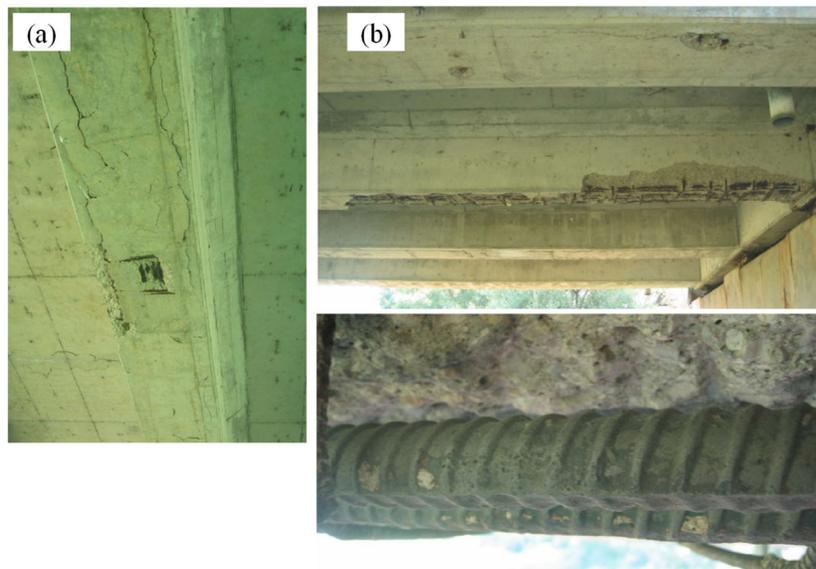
Corrosion damage on concrete bridge girder: (a) cracks and spalling (b) corroded steel reinforcement [34]
